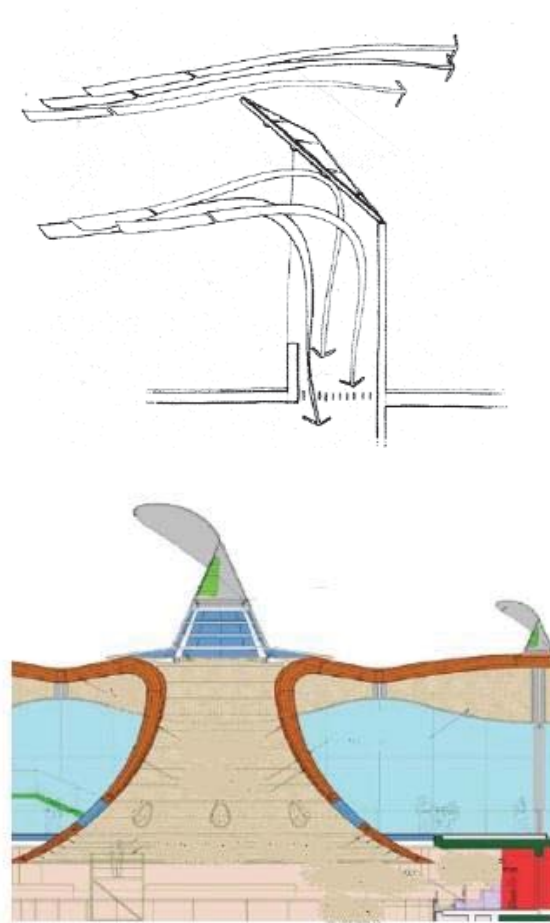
Public sector building in Wales. (Source: Khan et al., 2008)
